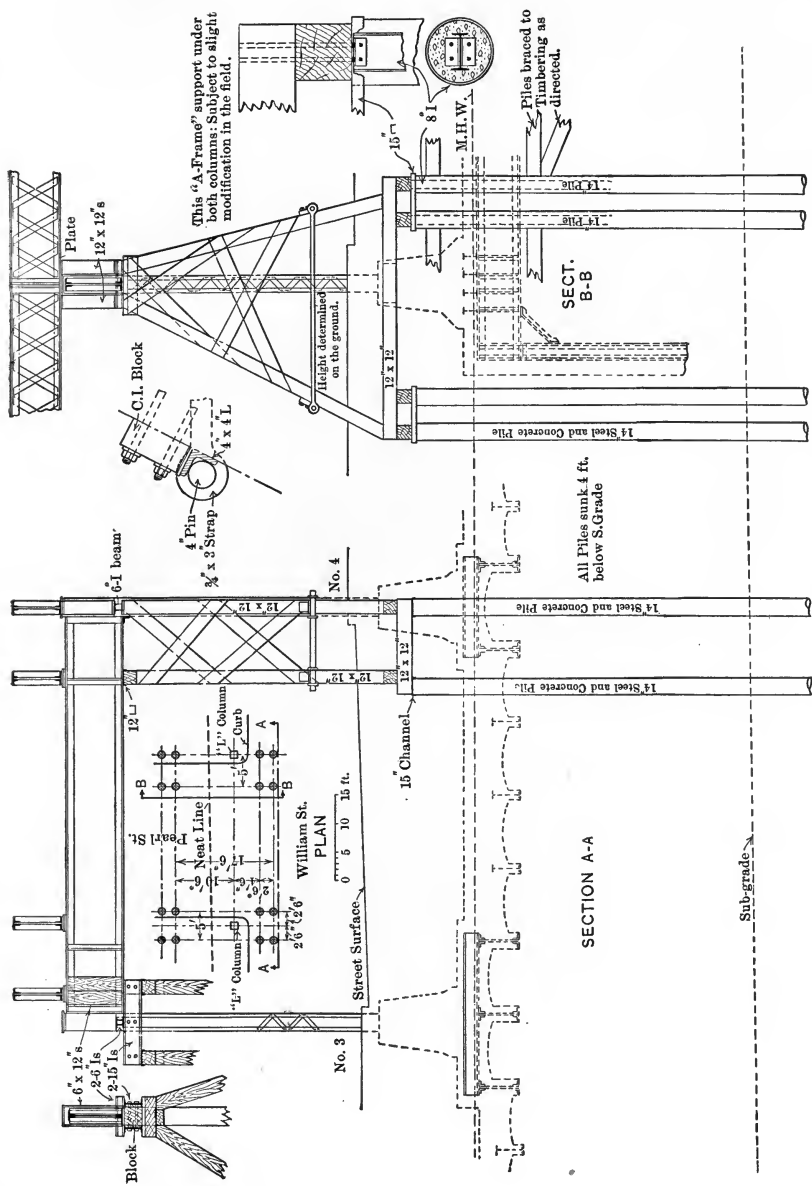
Plan of Underpinning Elevated Railroad Columns
